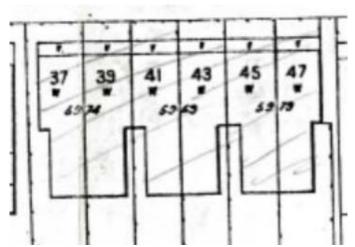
1908 Sewage plan showing the building separation for lightwells between each pair of units. (*Note: Units have since been renumbered. No. 39 in the figure above is now the subject site, No. 41.*)
